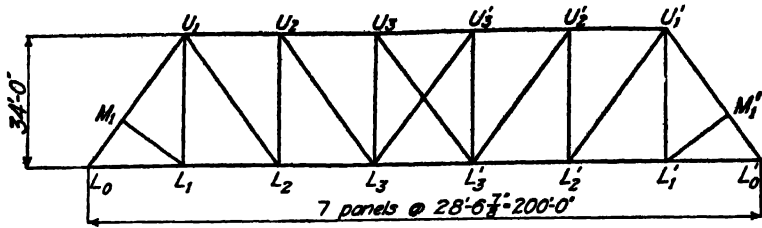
Truss Diagram of a 200-foot, Double-track-railway, Through, Riveted, Pratt-truss Span.
